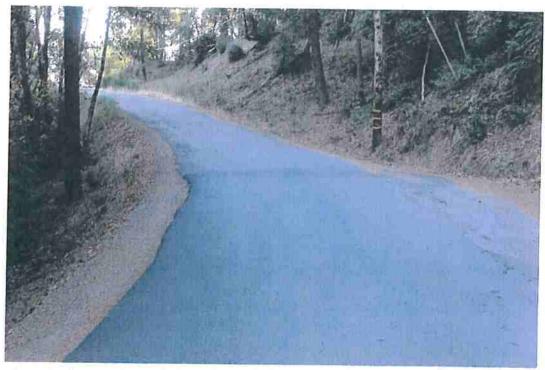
Mile 2.5: 18-ft road width with 2-ft shoulders.
